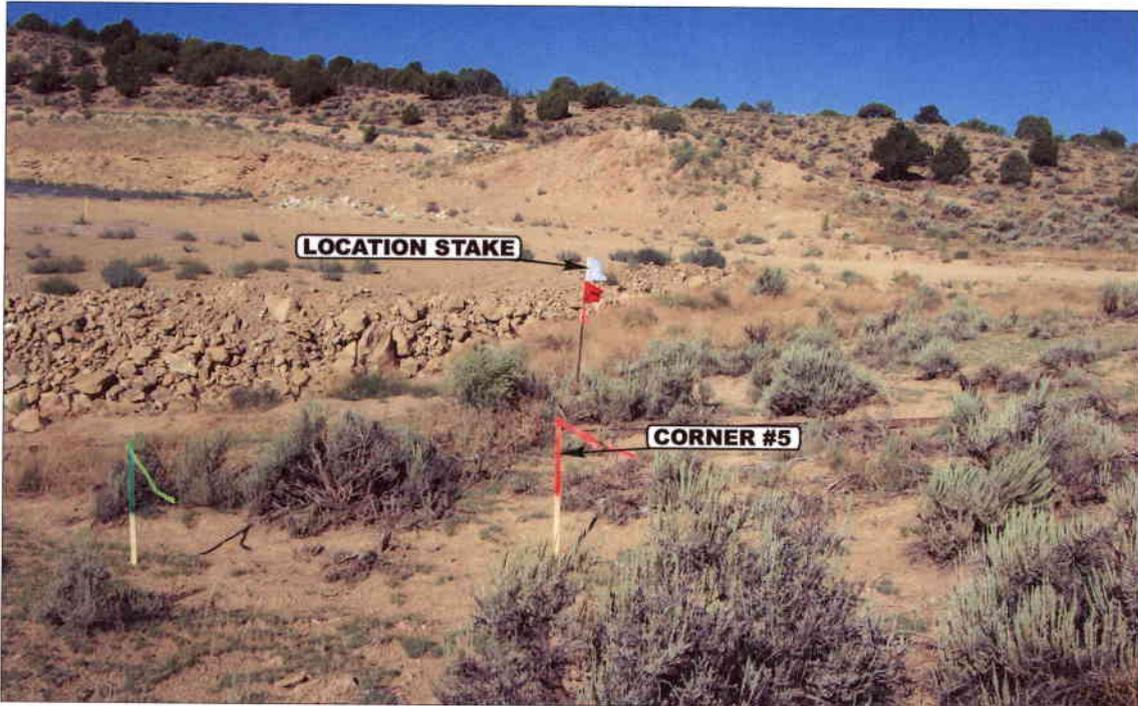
PHOTO: VIEW FROM CORNER #5 TO LOCATION STAKE
